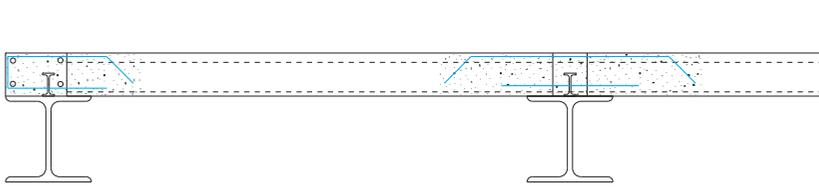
Semi-precast beams of normal or prestressed concrete. The beam-floor connection must always be a continuous, or at least partially continuous, restraint.
